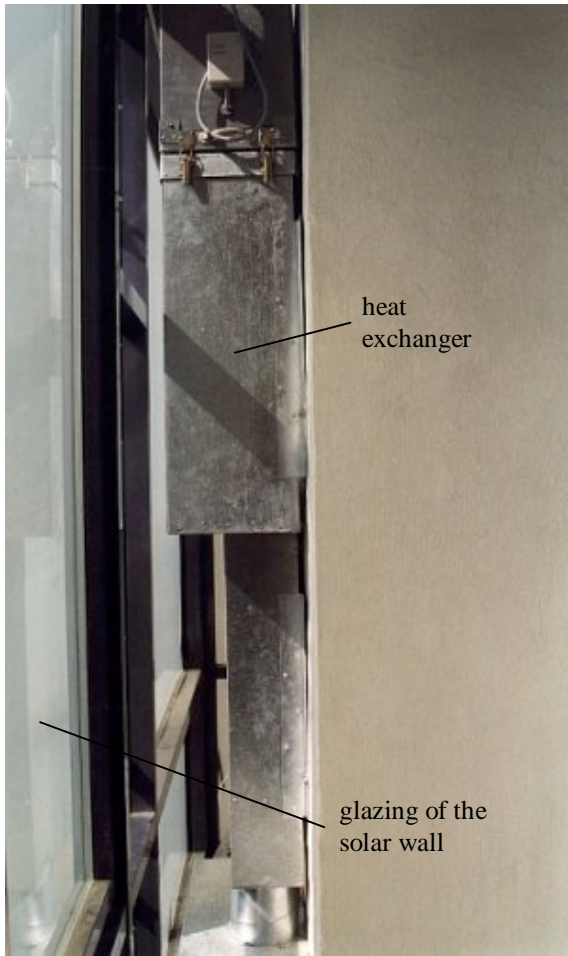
Photo of one of the heat exchangers in the solar walls and an entrance door to a solar wall.
